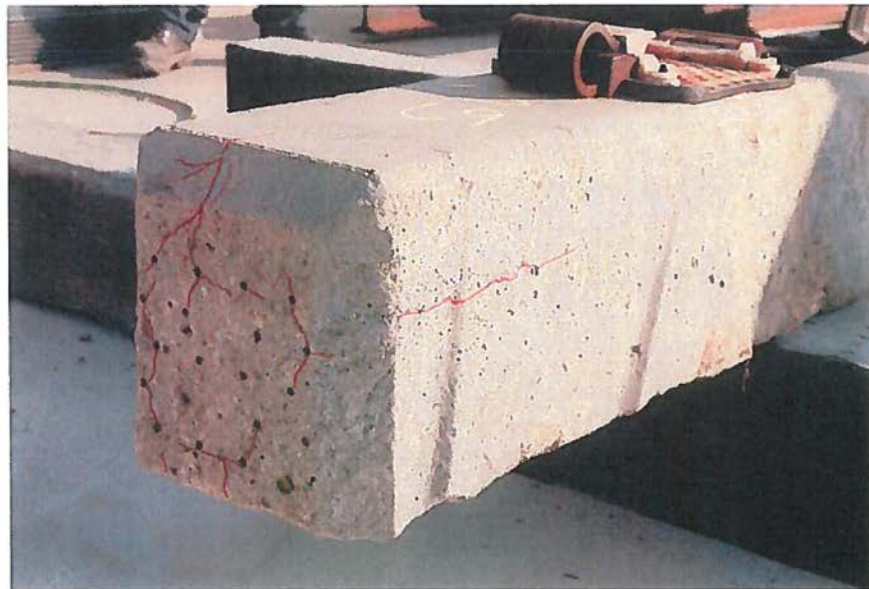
Oblique view of south end of tie NDT #69 with cracks outlined in red. L3672 102312 36
